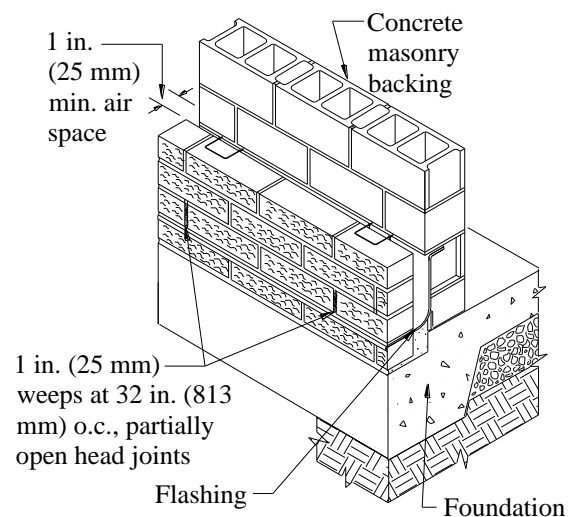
Typical brick veneer cavity wall geometry (insulation not shown) (with permission from the National Concrete Masonry Association)
